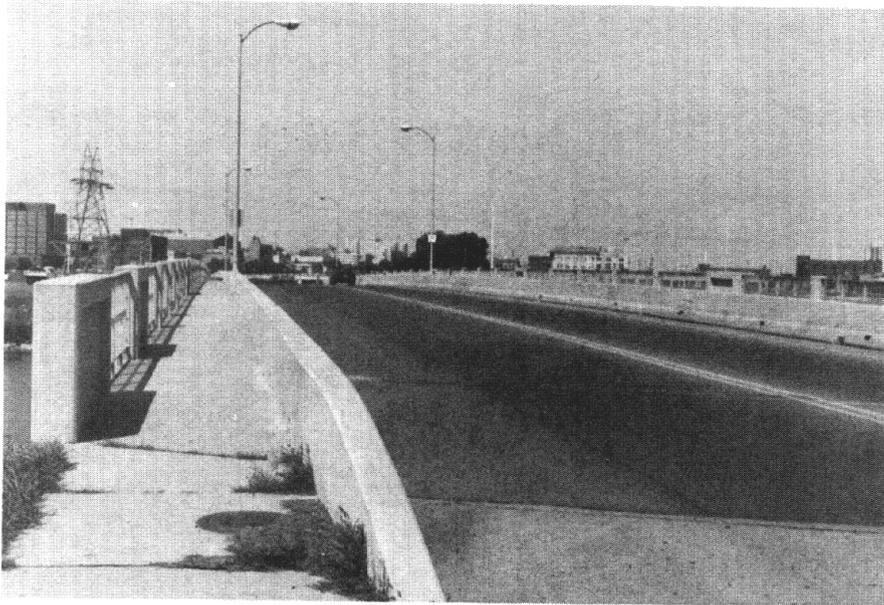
First Street Bridge, Racoon River, Des Moines.
